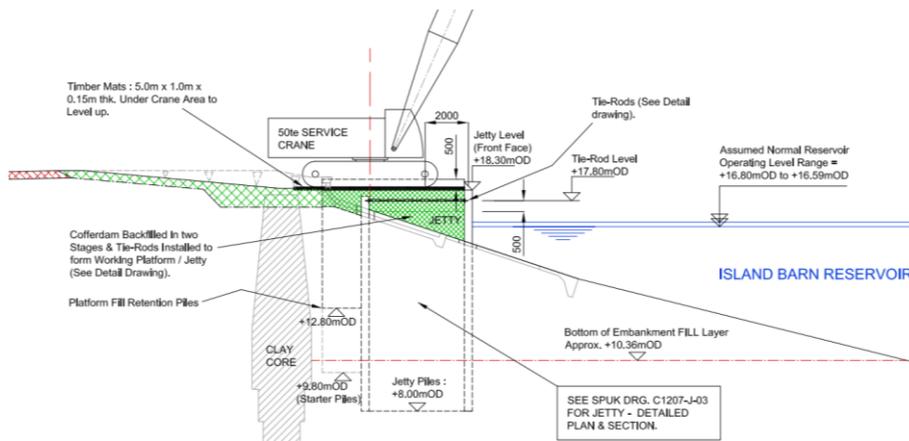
Jetty and Plateau (Extracted from Sheet Piling UK drawing)
